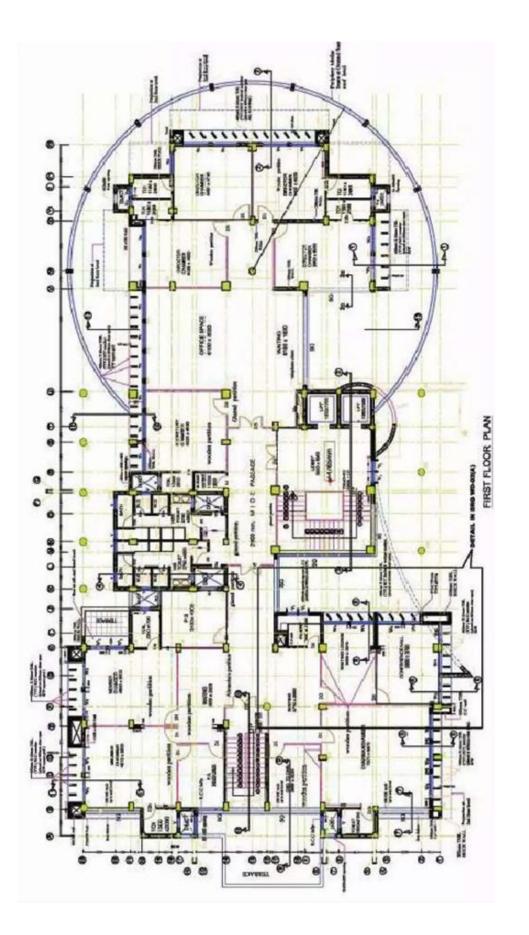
First Floor Plan - Floor Area - 687.0 Sq.Mts
